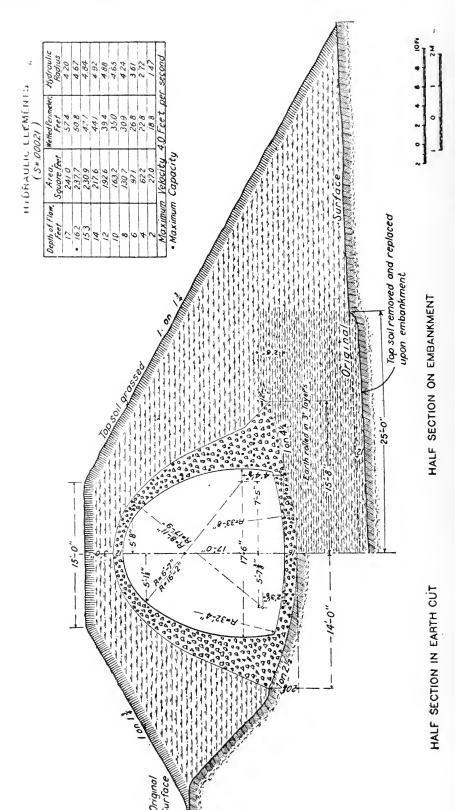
Typical Cut-and-Cover Construction in Earth Trench and on Embankment.
